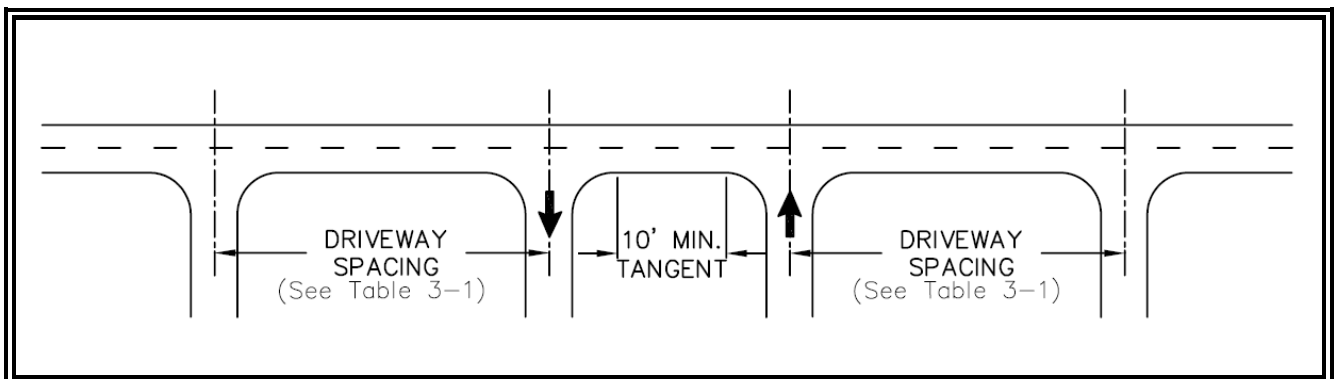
SPACING CRITERIA FOR ONE-WAY DRIVEWAYS
